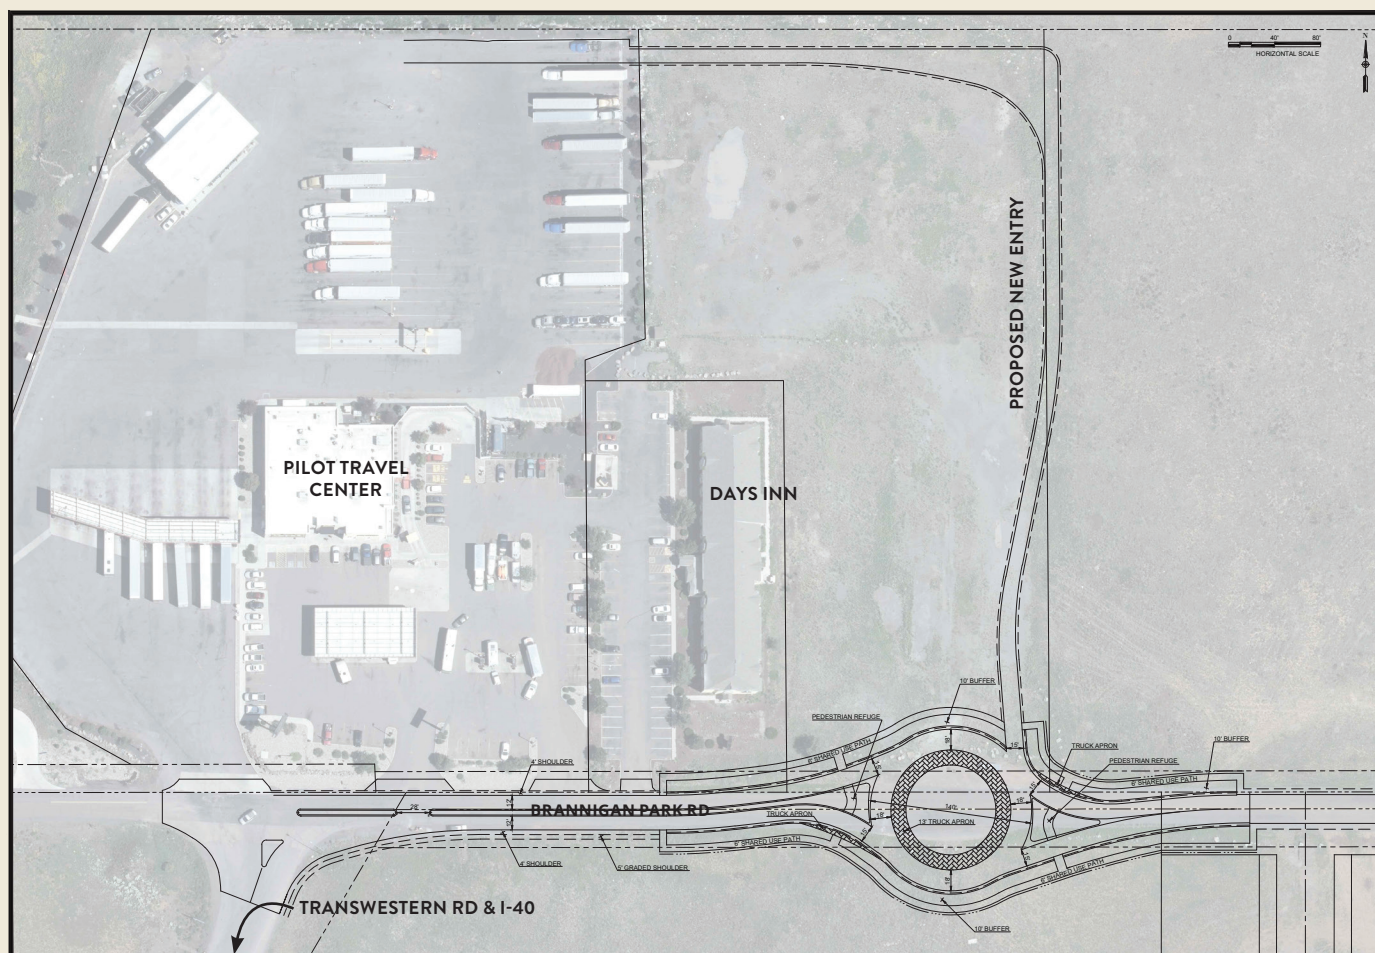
Proposed roundabout design (Source: *Bellemont Access Improvements Report*, Burgess & Niple, 2017)
